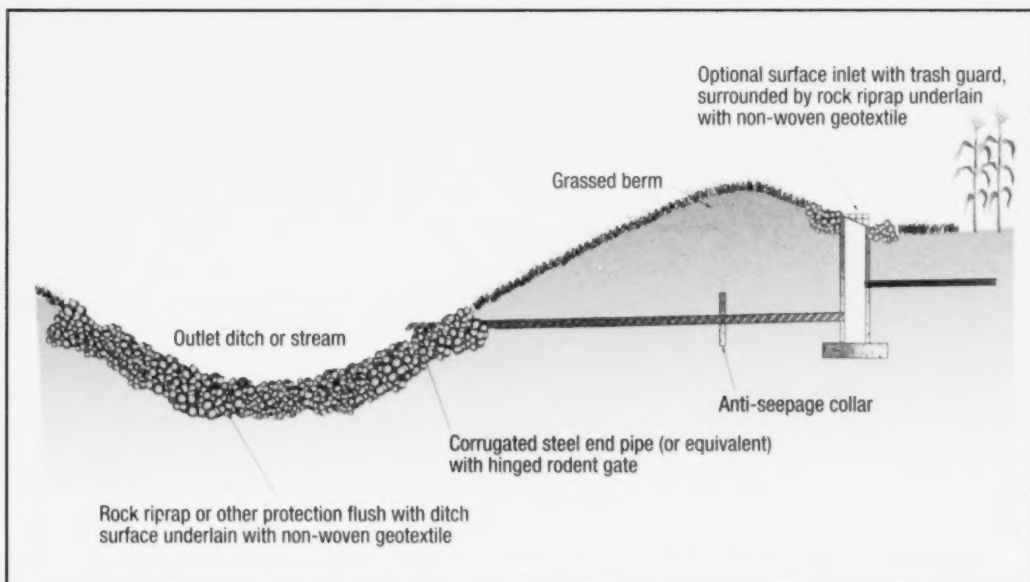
Drop Pipe Structure Outlet for Tile Drainage System
